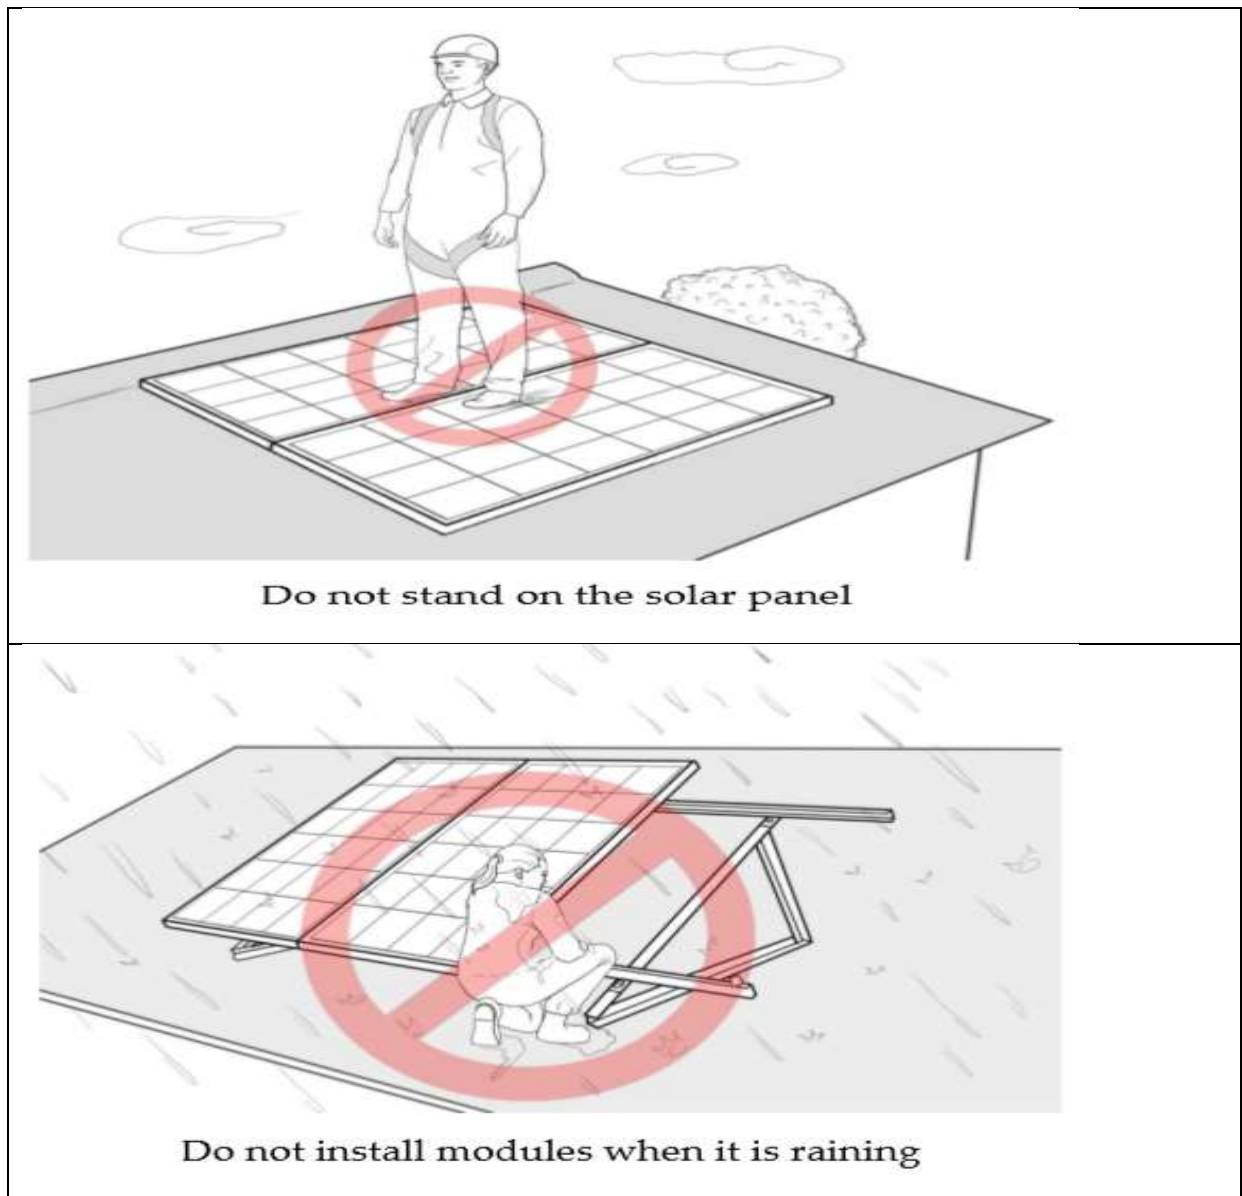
Examples of what to do and what to avoid on the site (GIZ, 2016)
